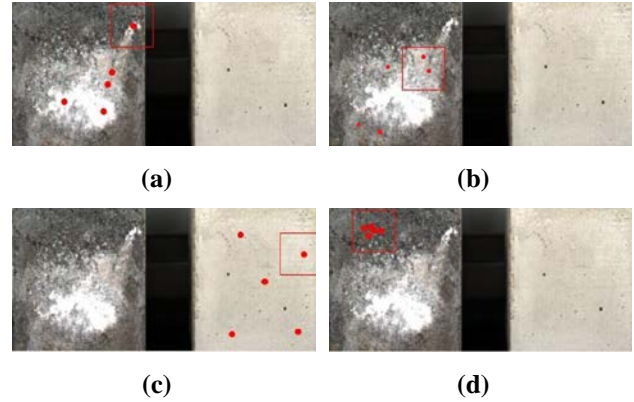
Pixel locations where hyperspectral profiles were extracted: (a) thick-layered efflorescence, (b) thin-layered efflorescence, (c) bright concrete, and (d) dark concrete.
